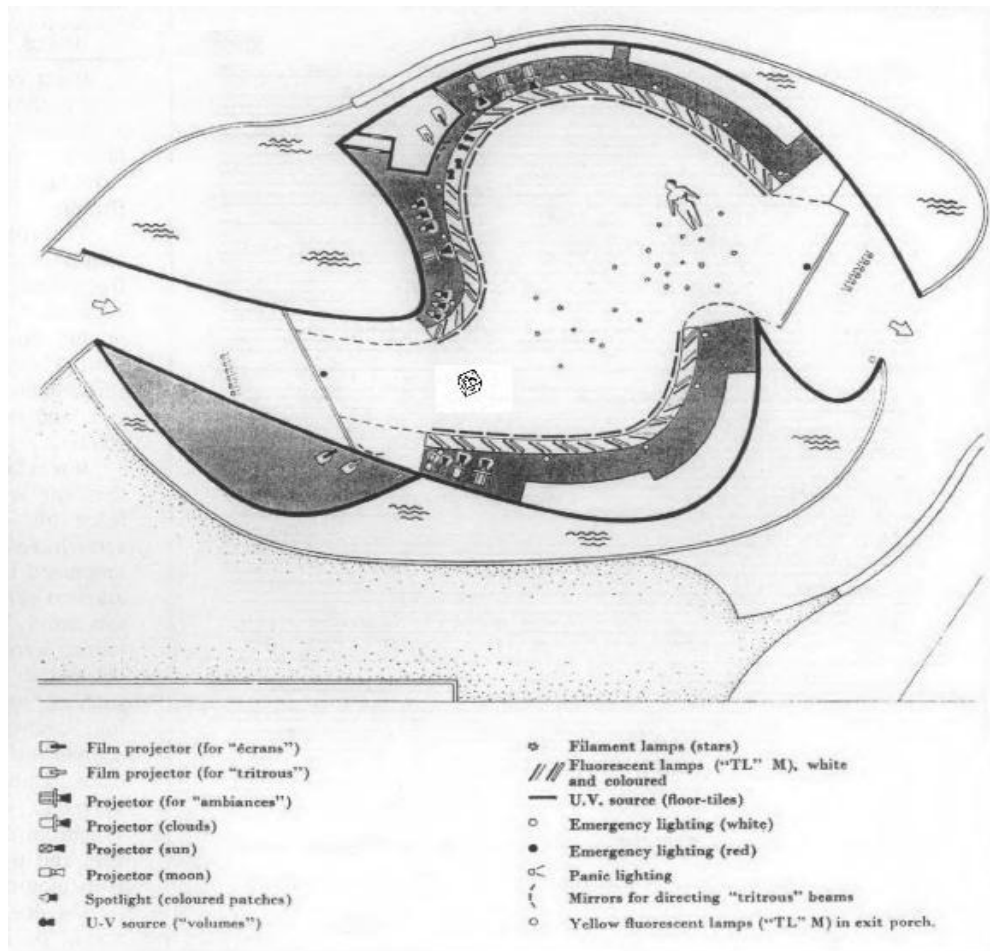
Plan of the pavilion showing the location of light and sound equipment
